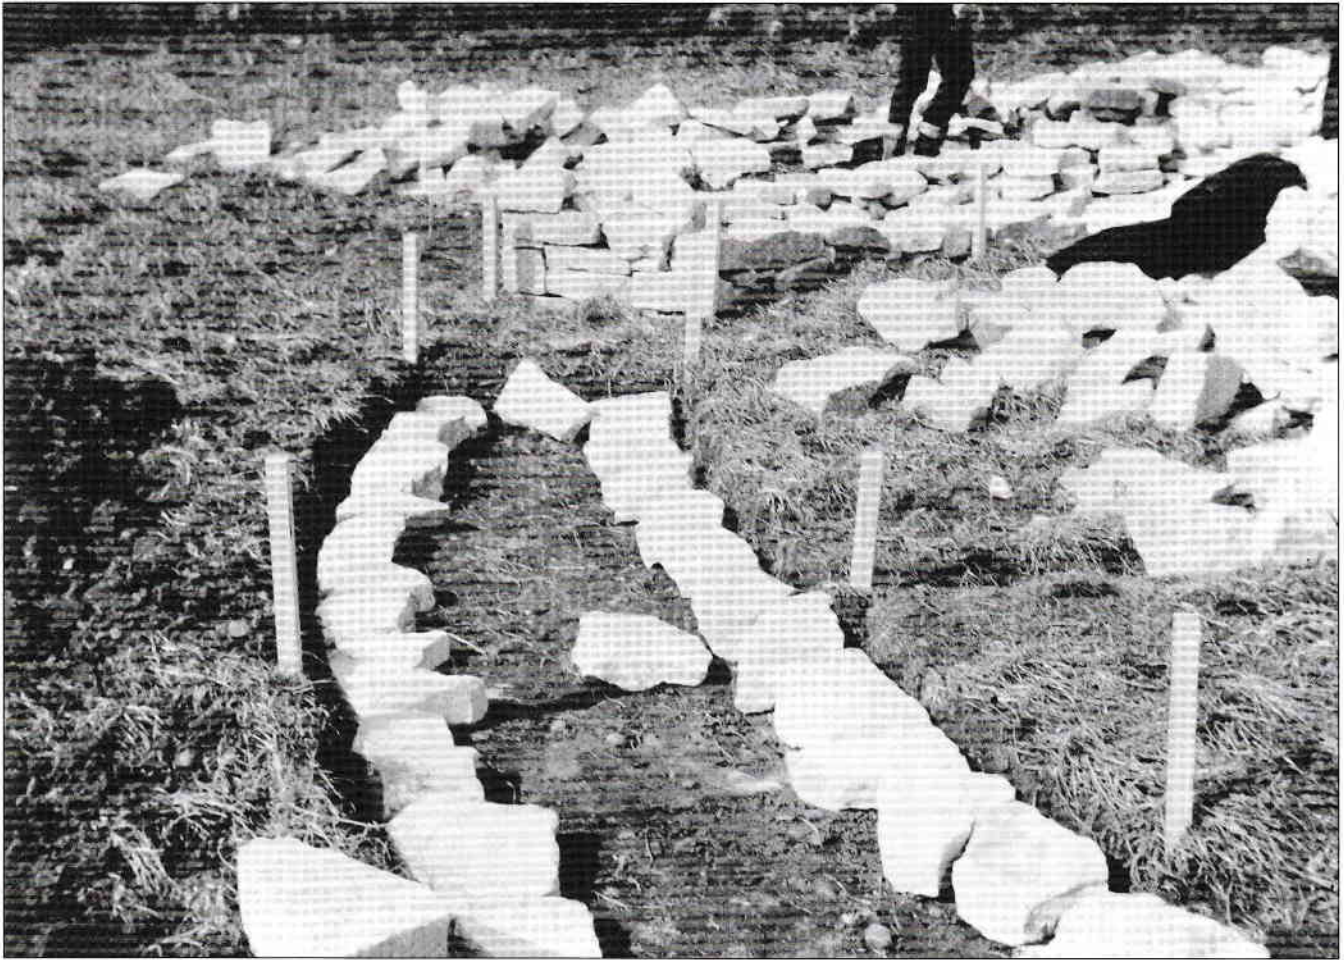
Avoncroft Museum of Buildings, Bromsgrove (Worcs). Conderton construct, lowest course of drystone wall facings in position on subsoil; combination of facing stones and through stones. Entrance gap marked out towards top of plate. Easter 1970. Photograph: Peter Reynolds
